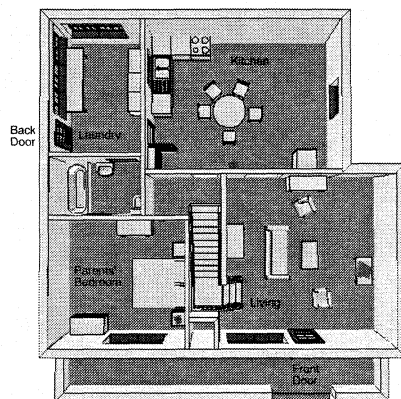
The Conner house, plan of main floor (not to scale).
